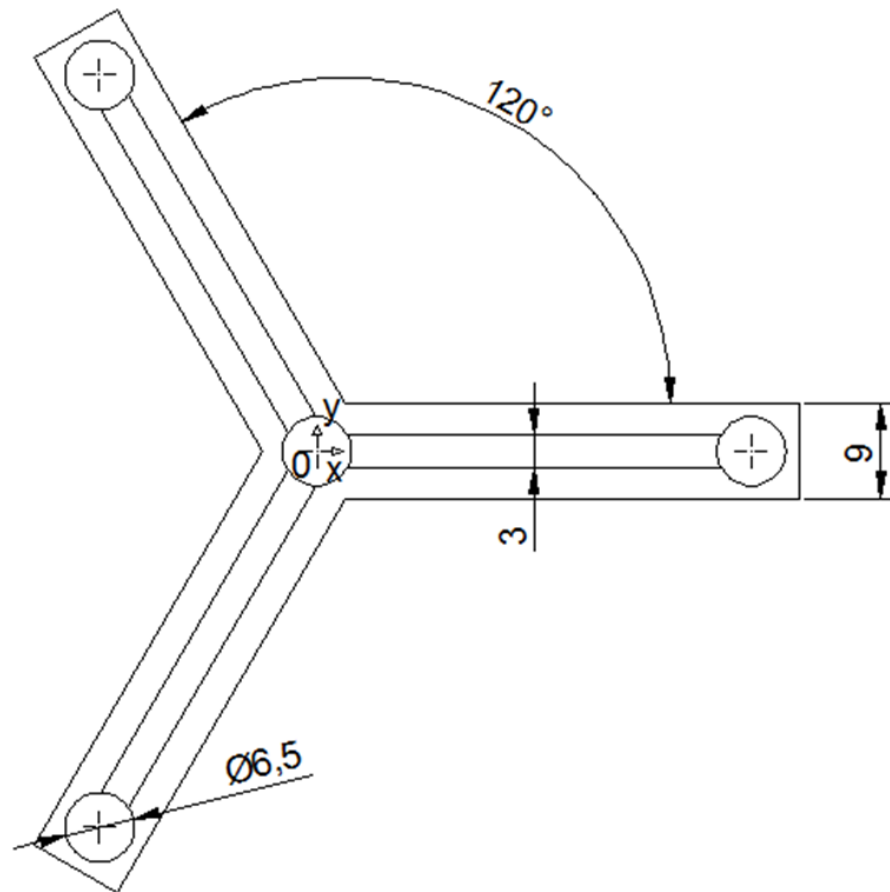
New CSC hull dimensions, upper view, dimensions in meters [m]
